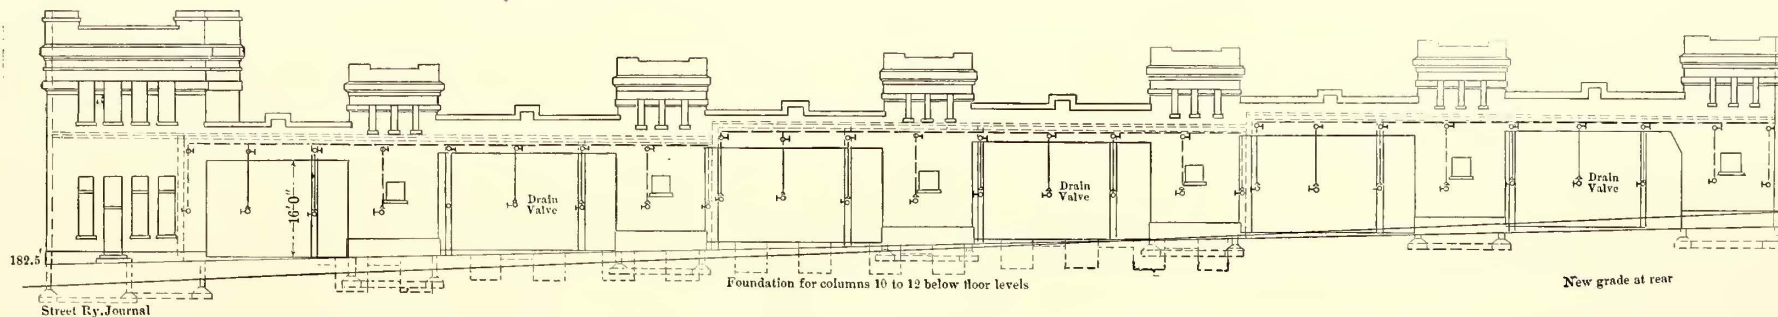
FRONT ELEVATION OF EDMONDSON AVENUE CAR HOUSE, SHOWING AISLE SPRINKLER
